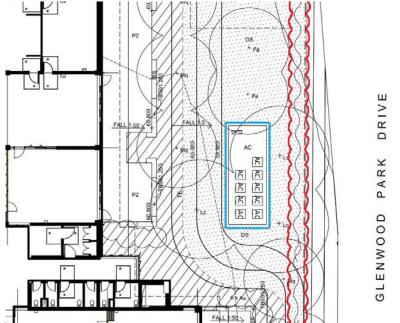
Proposed shrub planting (outlined in red) to the west the outdoor condenser unit (outlined in blue)
